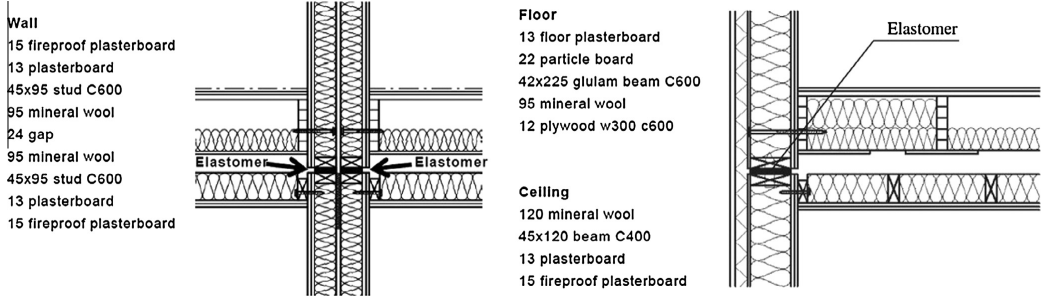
Drawings of the TVE building system, showing sections of the floor and ceiling structures and the junctions with apartment separating wall (left) and façade wall (right).
